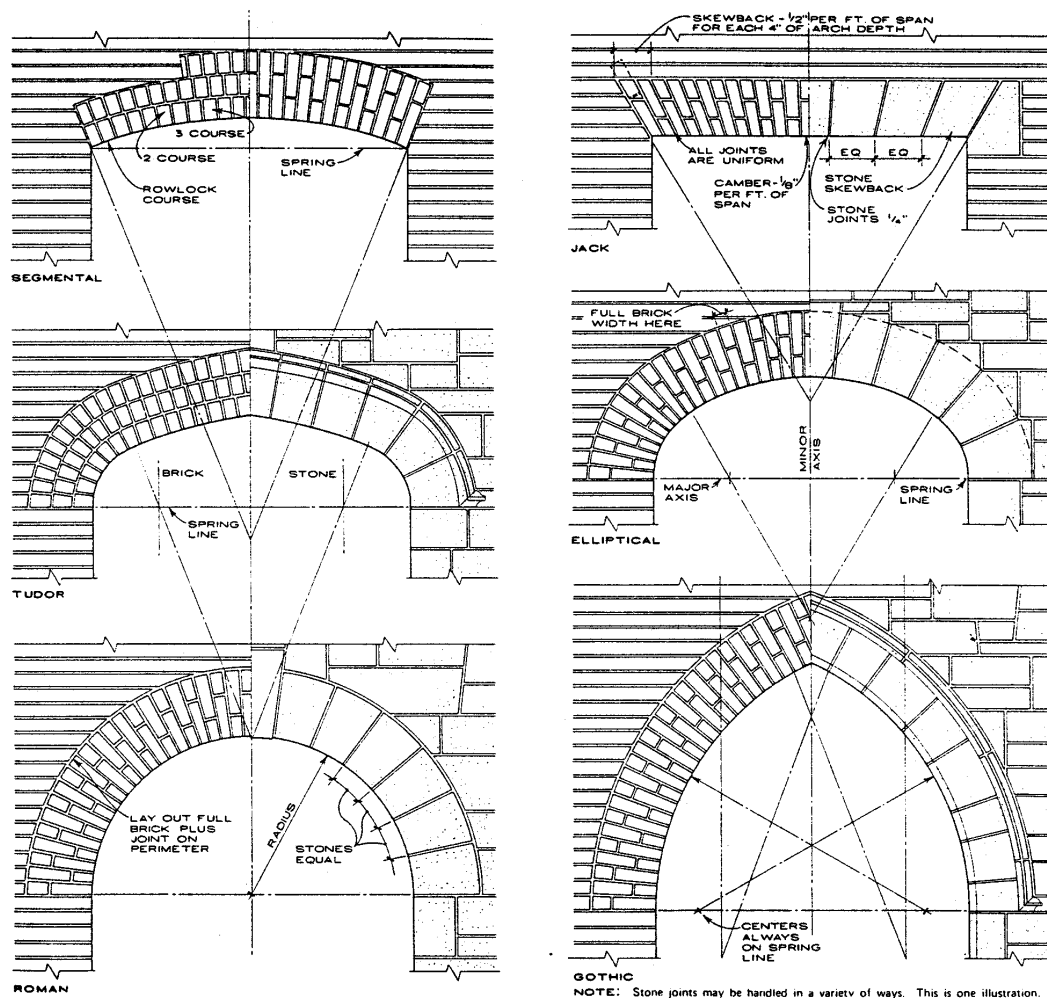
Drawings of typical window head features in URM bearing-wall buildings.
